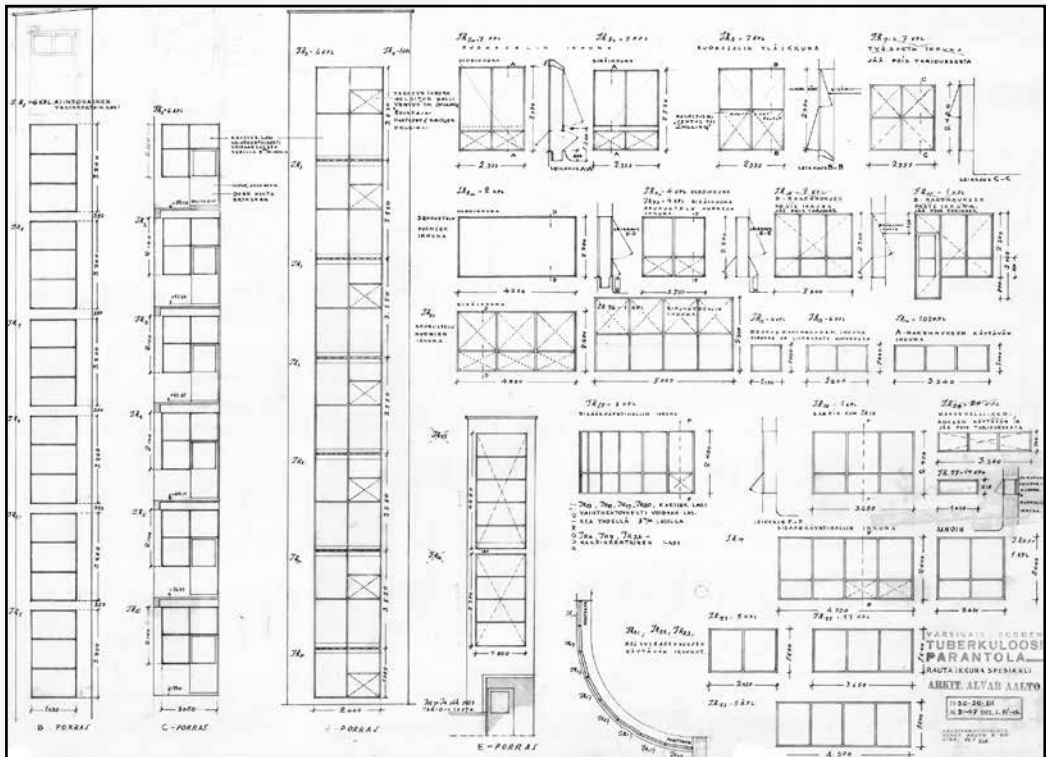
Window diagram of steel windows. Drawing No. 50-328. The drawing has been edited. AAM.
